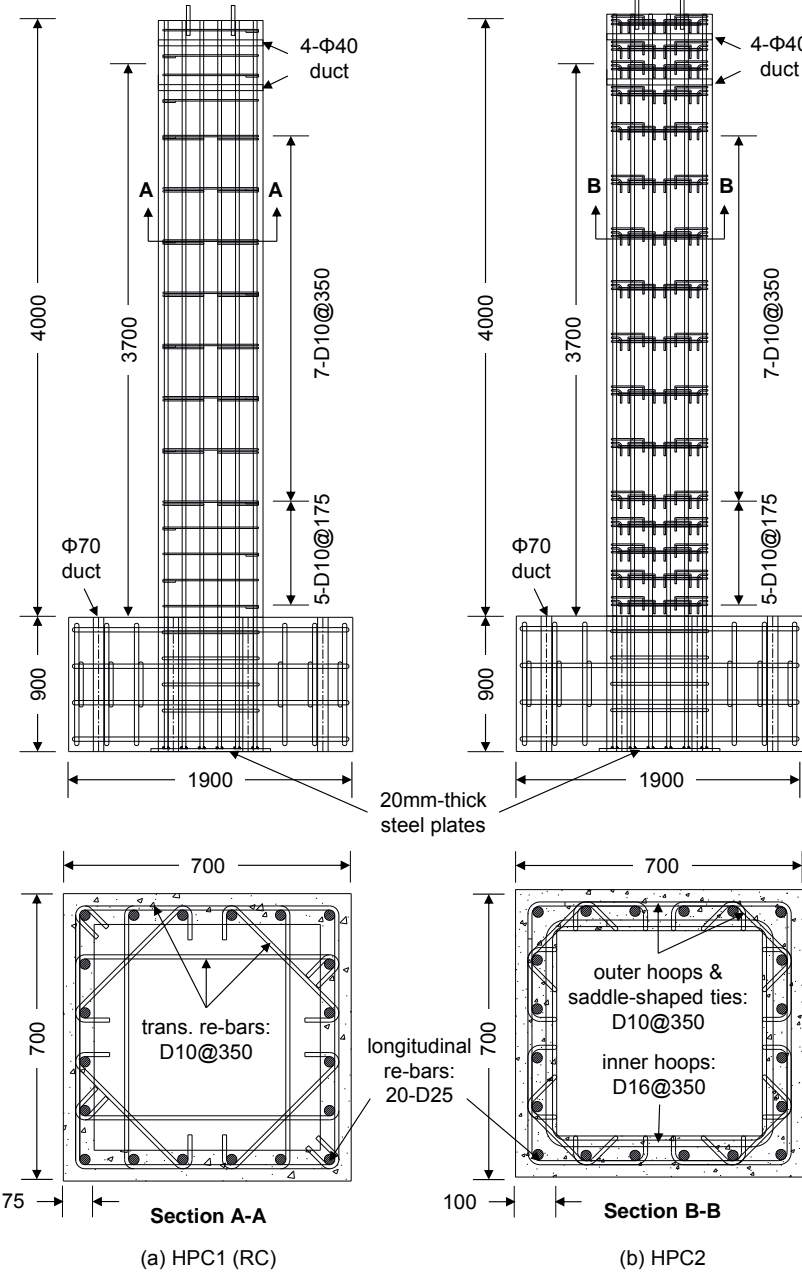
Dimensions and configuration of test specimens (units: mm)
